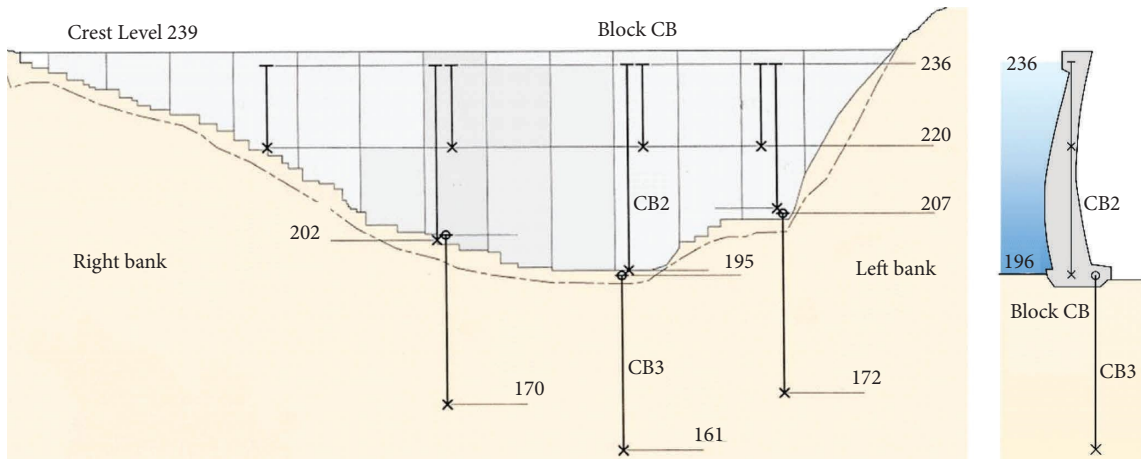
Downstream view and section view of the dam pendulum monitoring instruments (unit: m).
